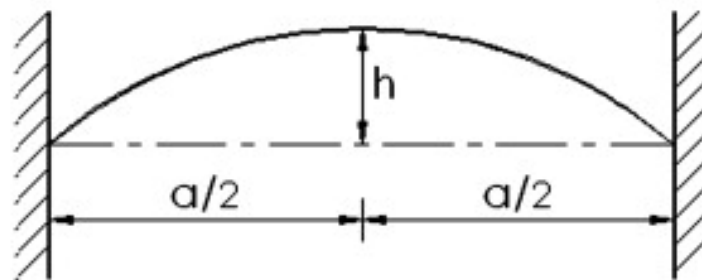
Circular arch plan view (Zingoni et al., 2013).
